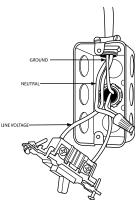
Field-Supplied Electrical Box on Furnace Casing
